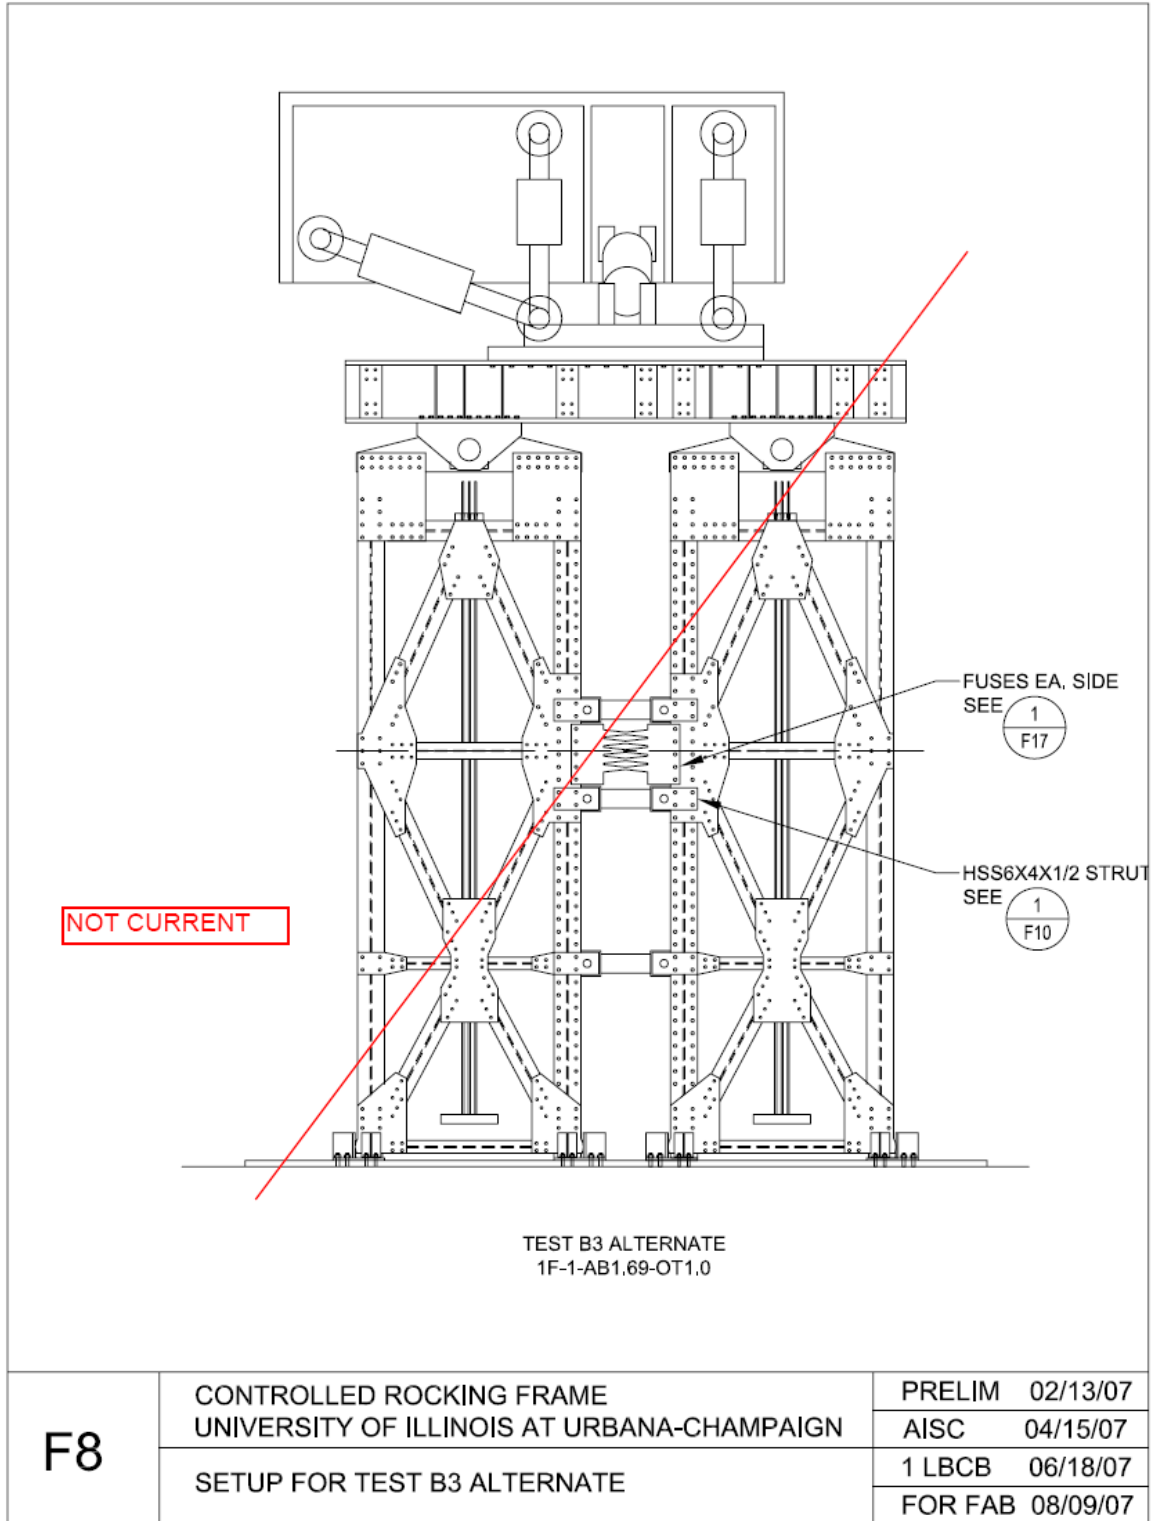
Specimen Design Drawing – Setup for Test B3 Alternate
